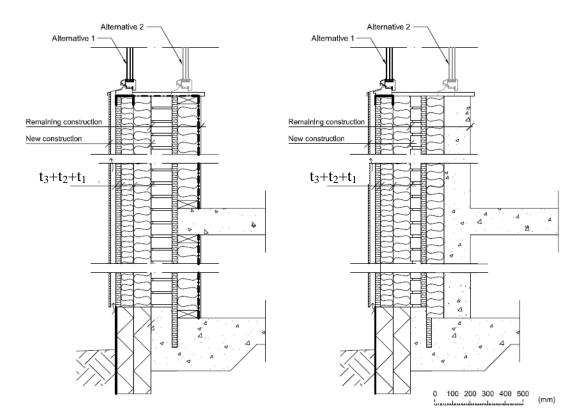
Infill and load bearing wall. Additional insulation, no demolition.
